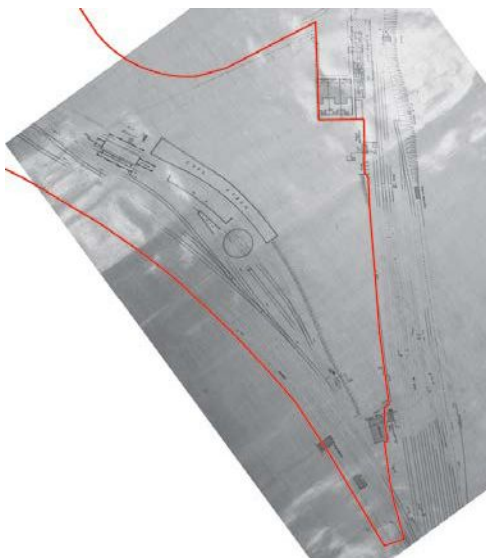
(centre): Rating plan of Corkickle Station, early 20th century (CAC(W) TBR 1/8/95 early 20th century)
